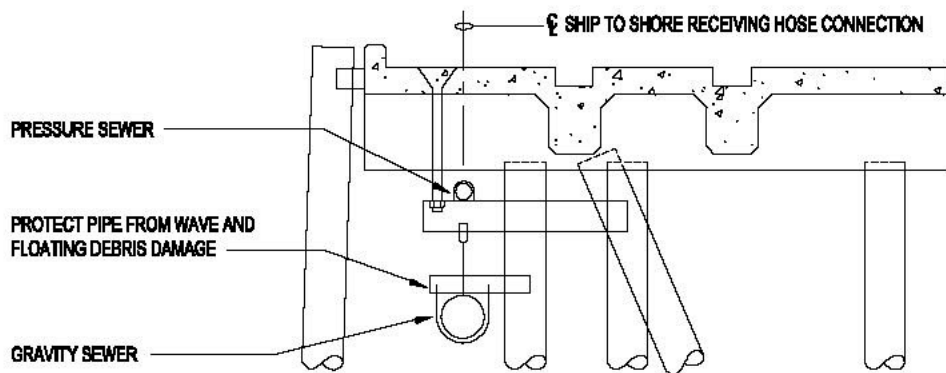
(b) Typical Sewage Collection Facilities (2 of 2)
